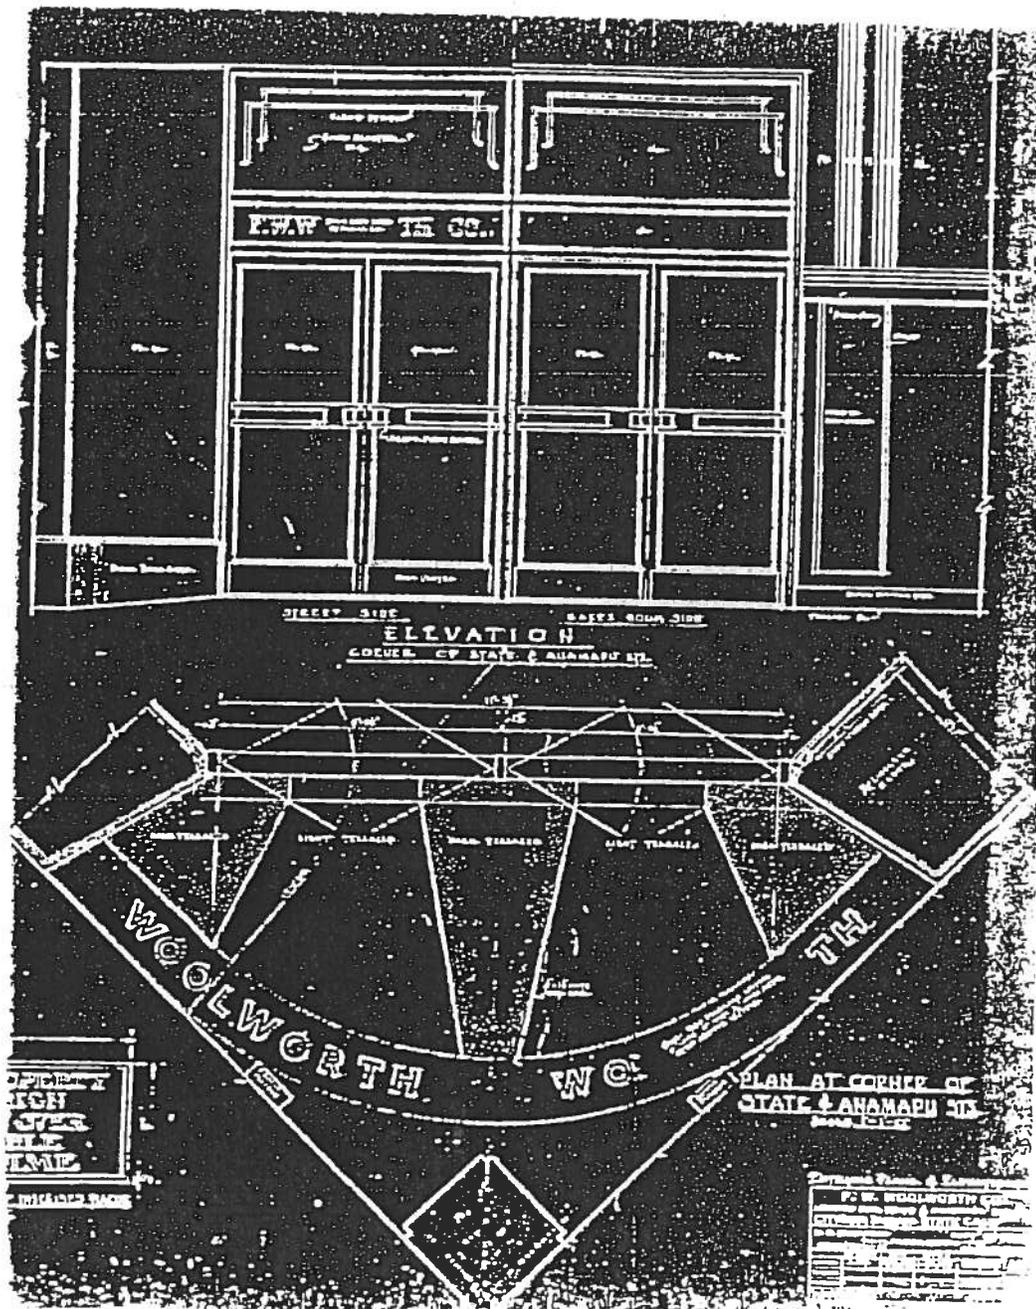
Woolworth's Conceptual Plan 1949-north corner detail
